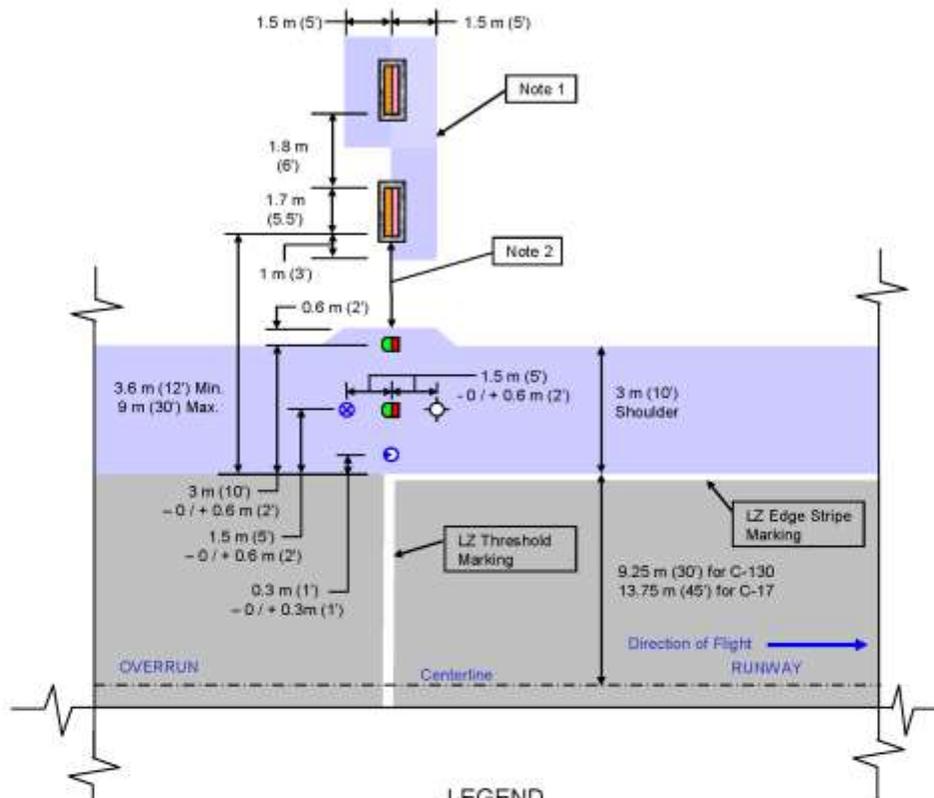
Typical Bi-Directional Runway/Taxiway Marking and Lighting Layout
